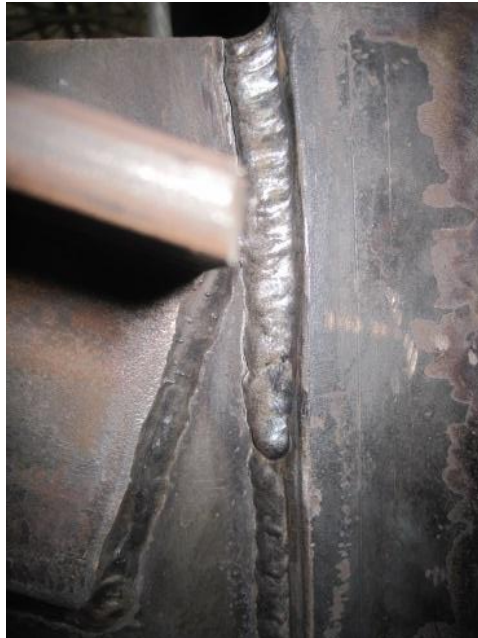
Overlap of Angle-Gusset Weld and Gusset-Connection Plate Weld (XF_4)
